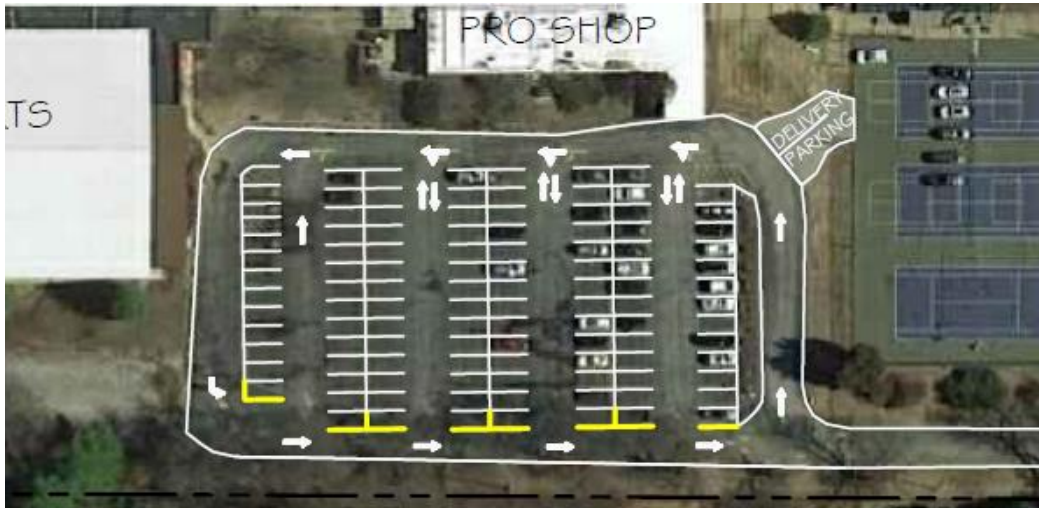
Close-up of the Applicant's Proposed Parking Plan showing existing 104 parking spaces and proposed 112 spaces.
